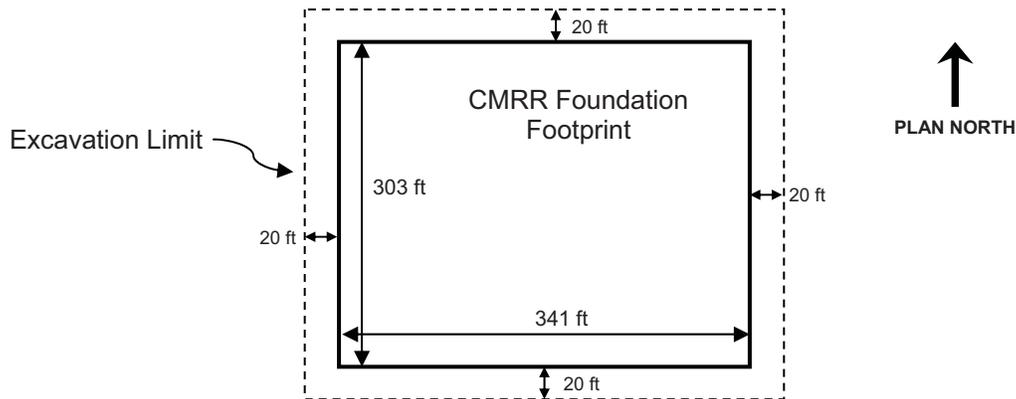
Foundation Footprint and Excavation Limit Dimensions of the CMRR Facility
